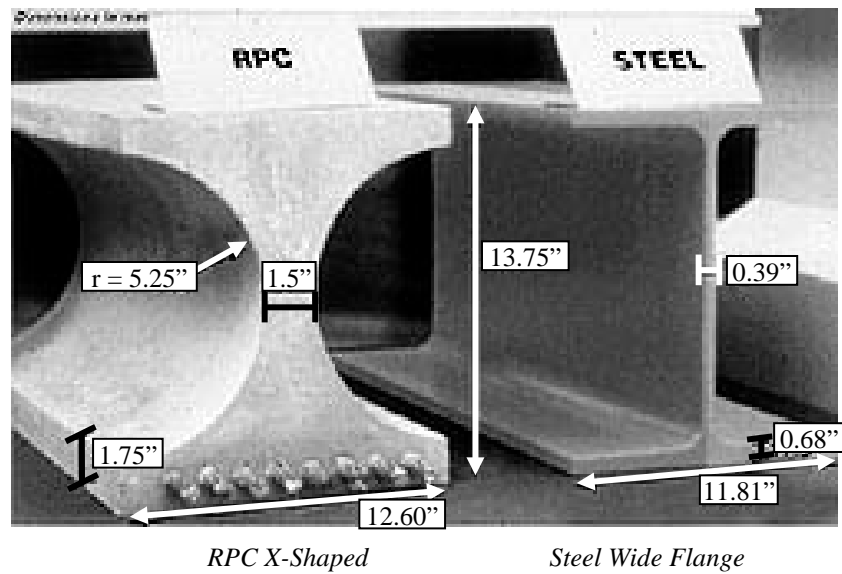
Reactive Powder Concrete (RPC) Prestressed X-beam
